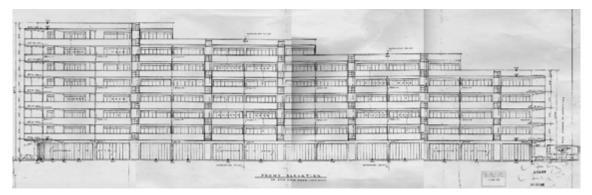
The elevations of 13 Streets buildings reflecting the ascending height according to the flight landing skyline toward Kai Tak Airport.
